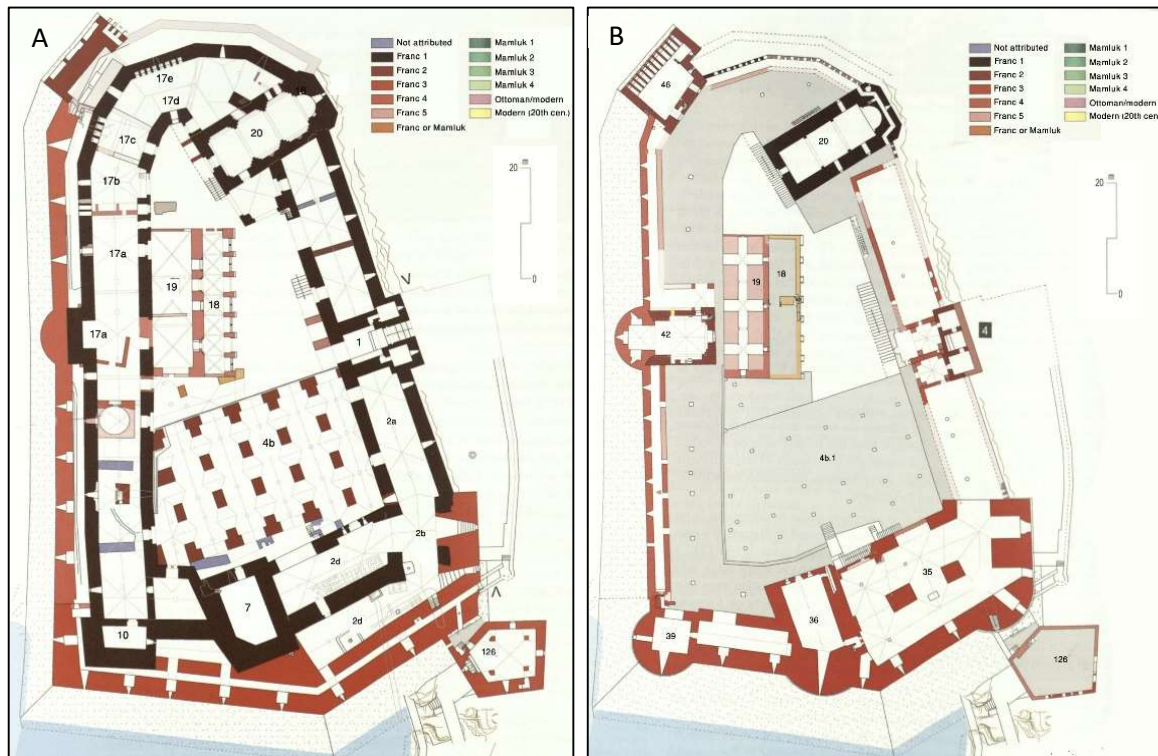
The second Frankish building period of the upper castle. A) the ground floor. B) the first floor
